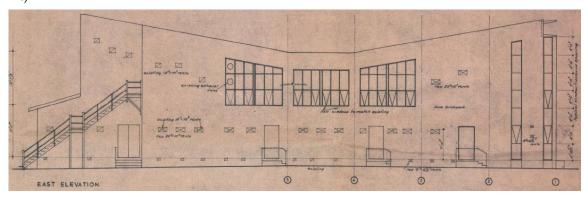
Drawing related to building permit 4609. Proposed east elevation (K Popper, Nov. 1972) (Source: Council Building File)
